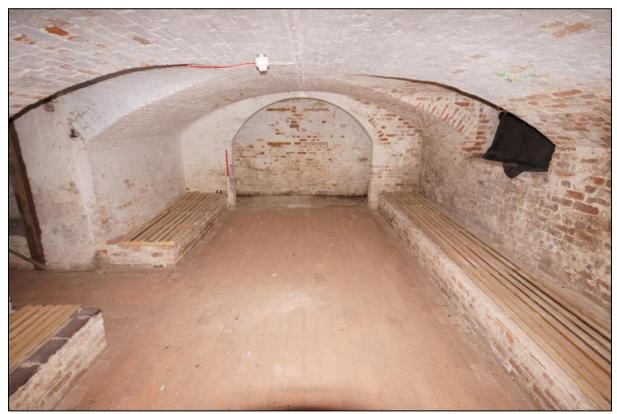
General view of Room C01, viewed looking north-west. Scale = 1m.
